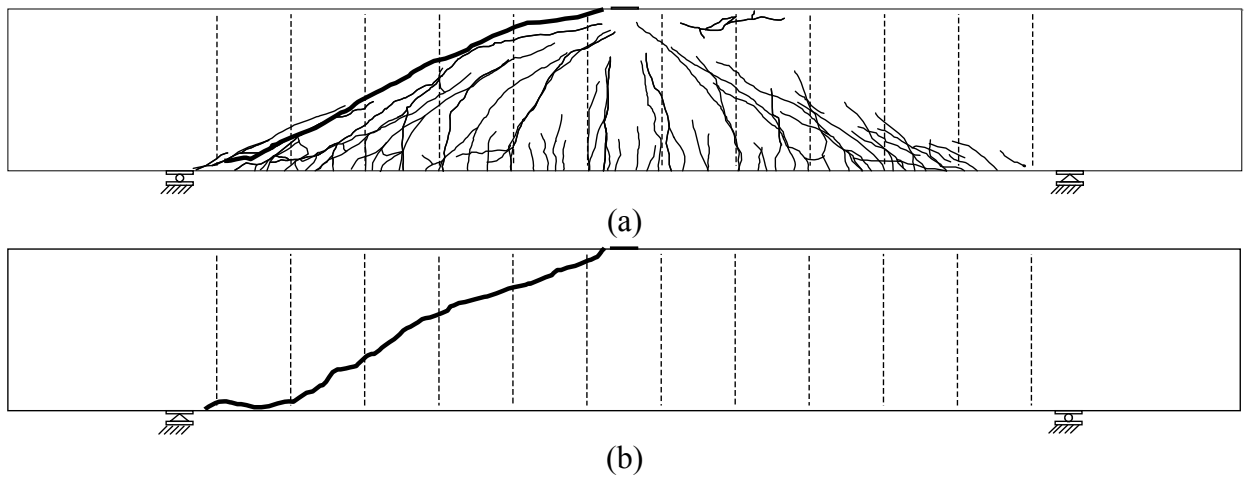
Observed damage in specimen P2S6, (a) front side, (b) back side
